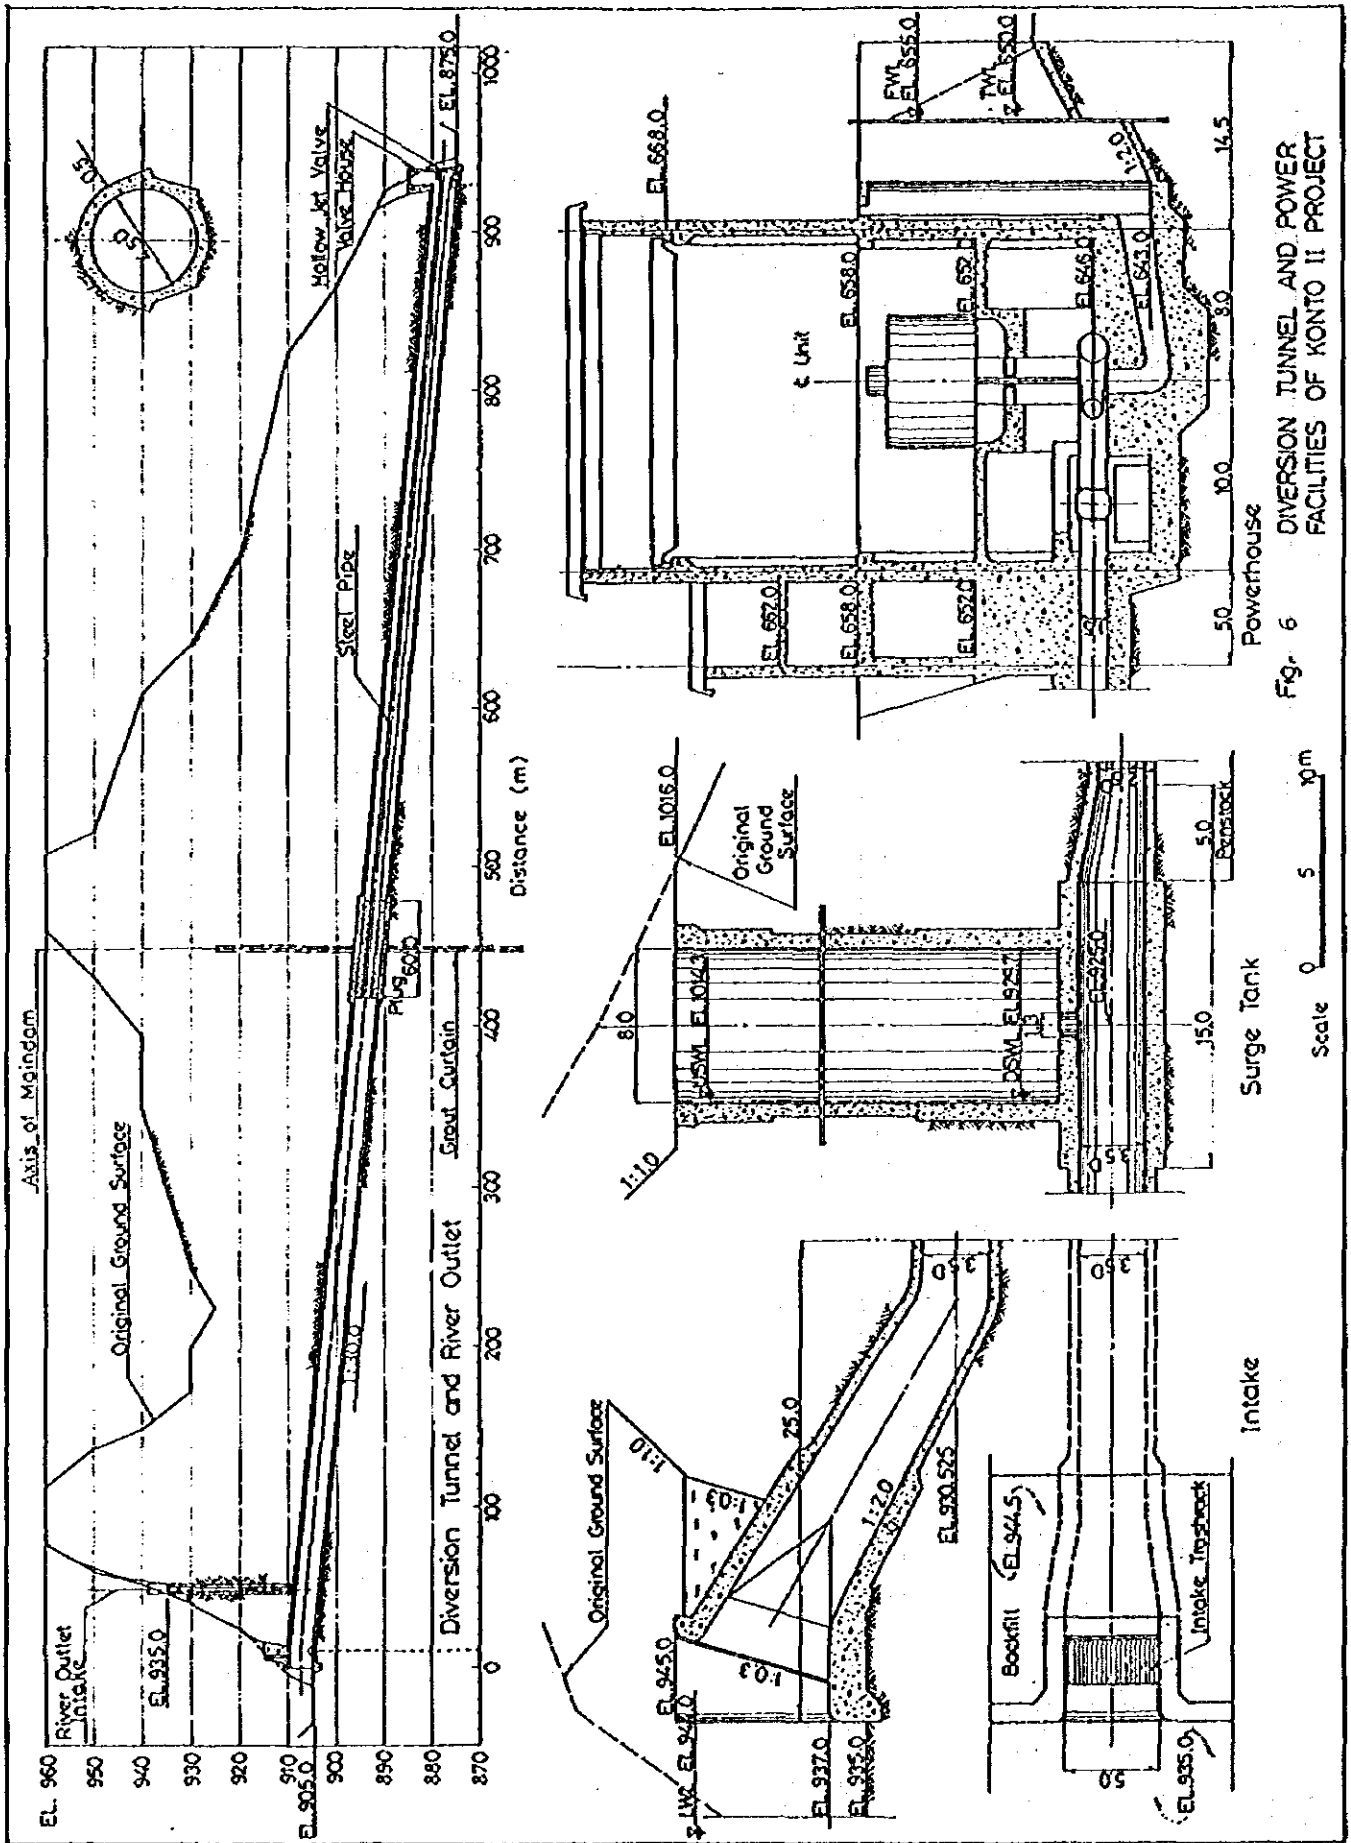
DIVERSION TUNNEL AND POWER FACILITIES OF KANTO II PROJECT
